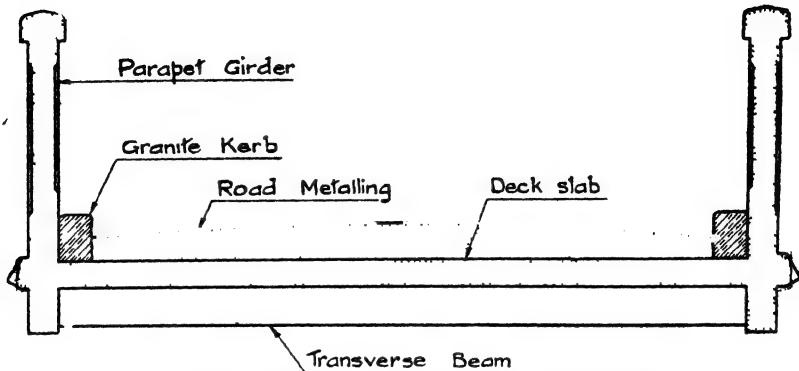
Cross Section of Parapet Girder Road Bridge.
